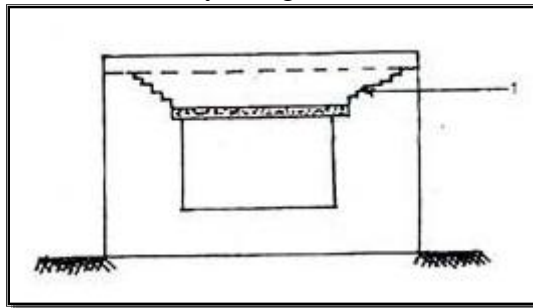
Diagonal cracks over R.C.C. lintel.
